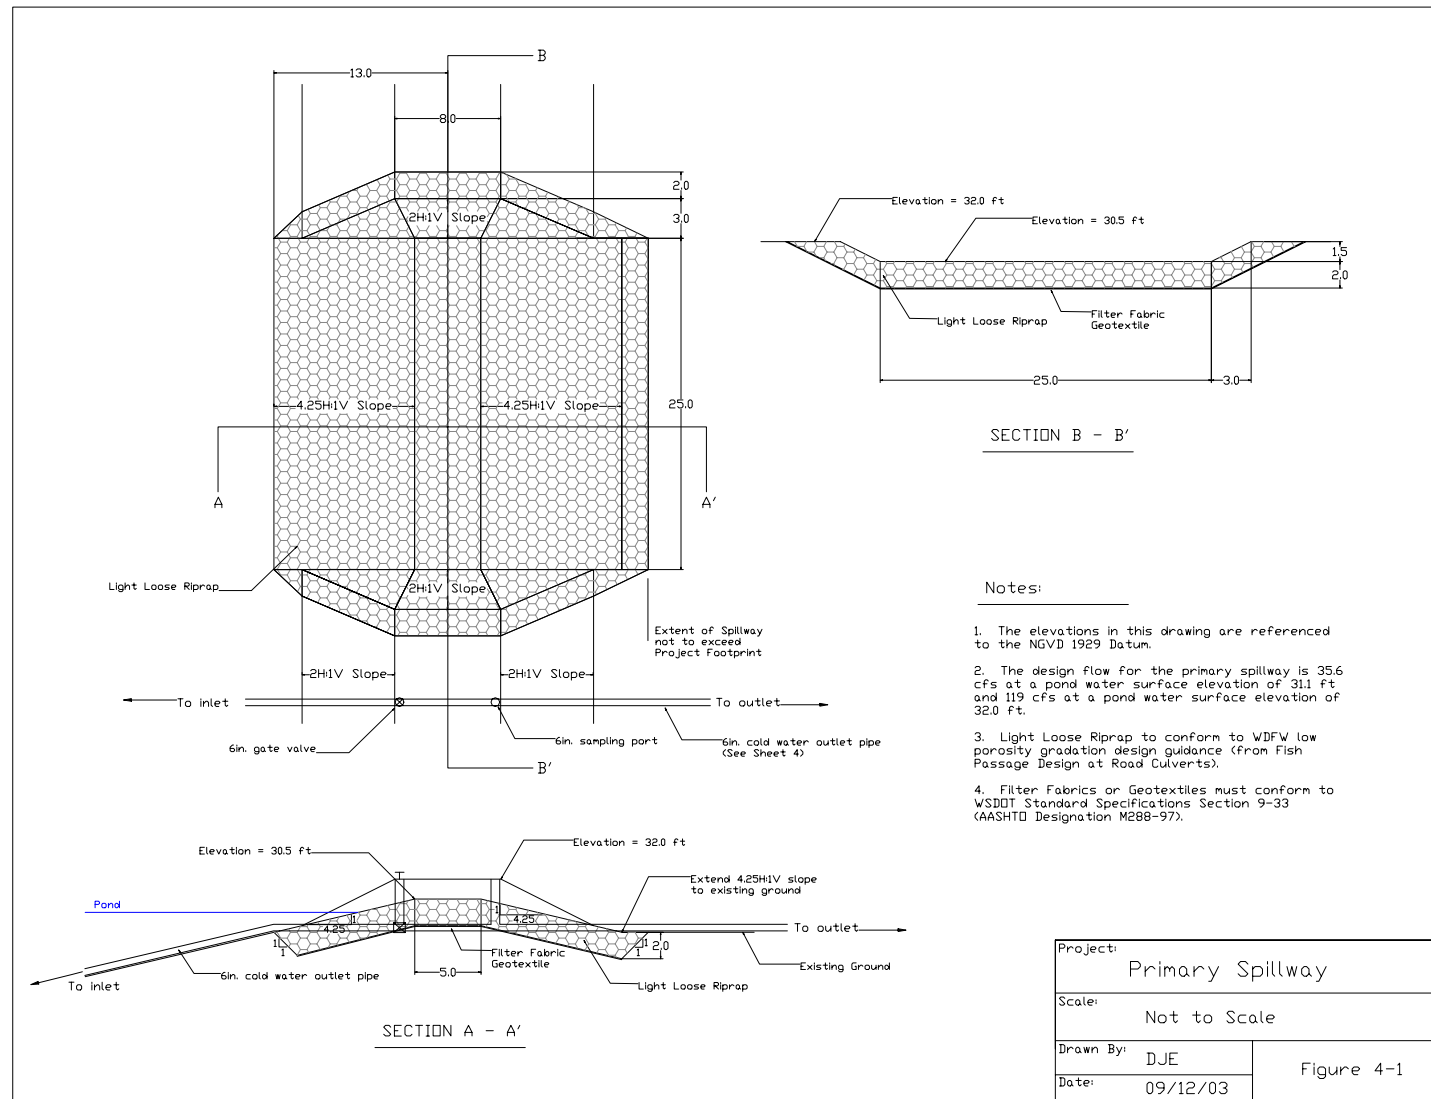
Conceptual design for the Pond 5 outlet structure.
